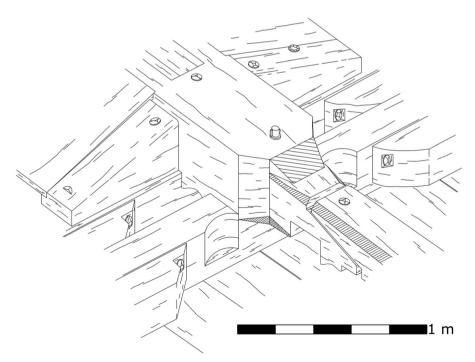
Aft section of the expanded keelson with cut away showing half of the pump sumps cut out of the floor timber. (Drawing by Author)
